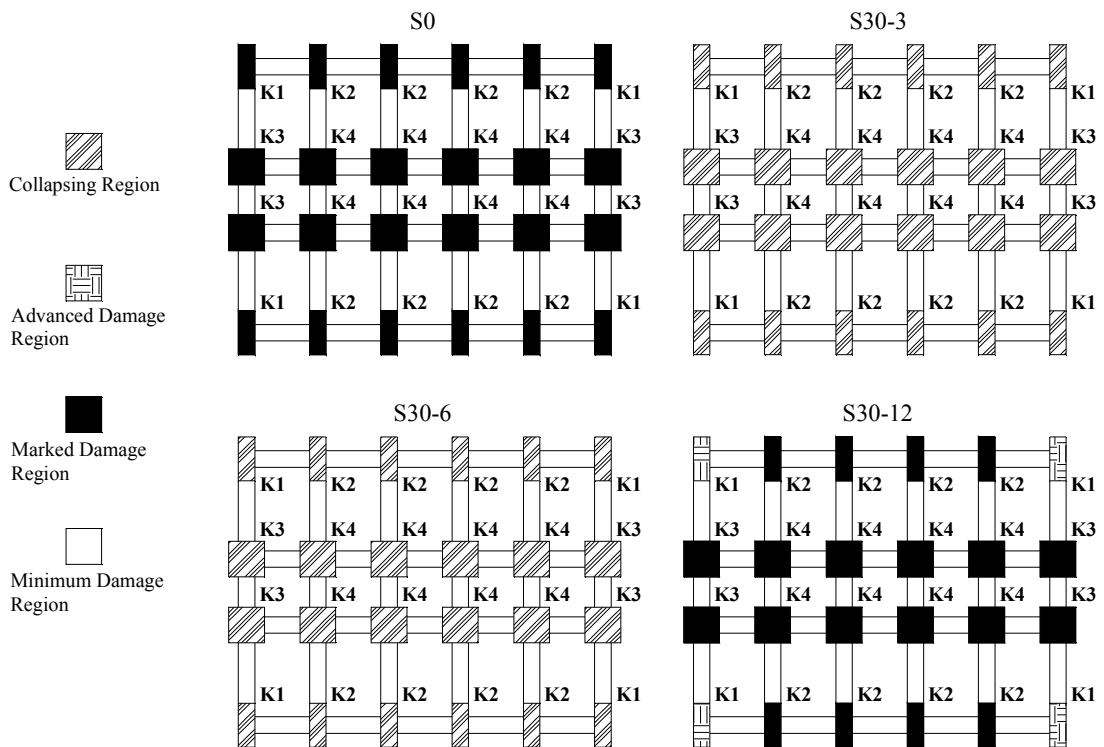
Damage levels of base columns of S0, S30-3, S30-6 and S30-12 buildings.
